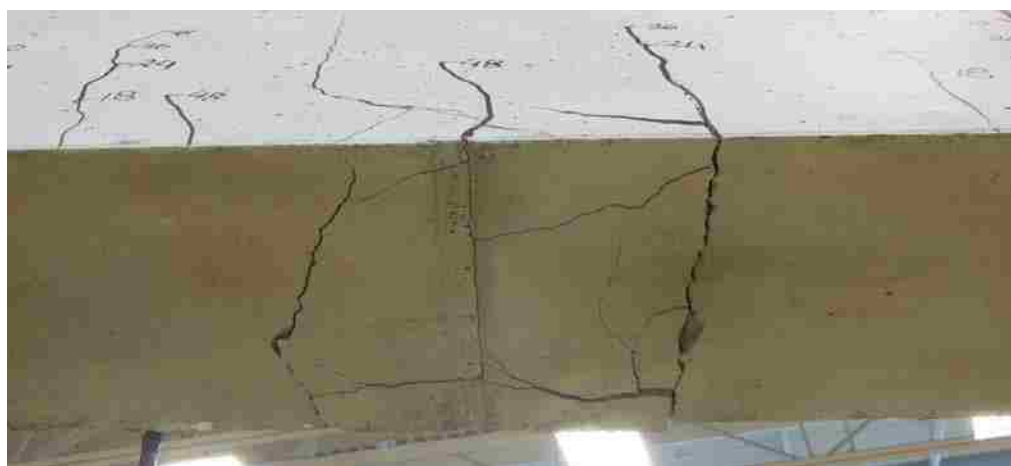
Crack Pattern of Specimen TWOC-70 (Bottom View)
